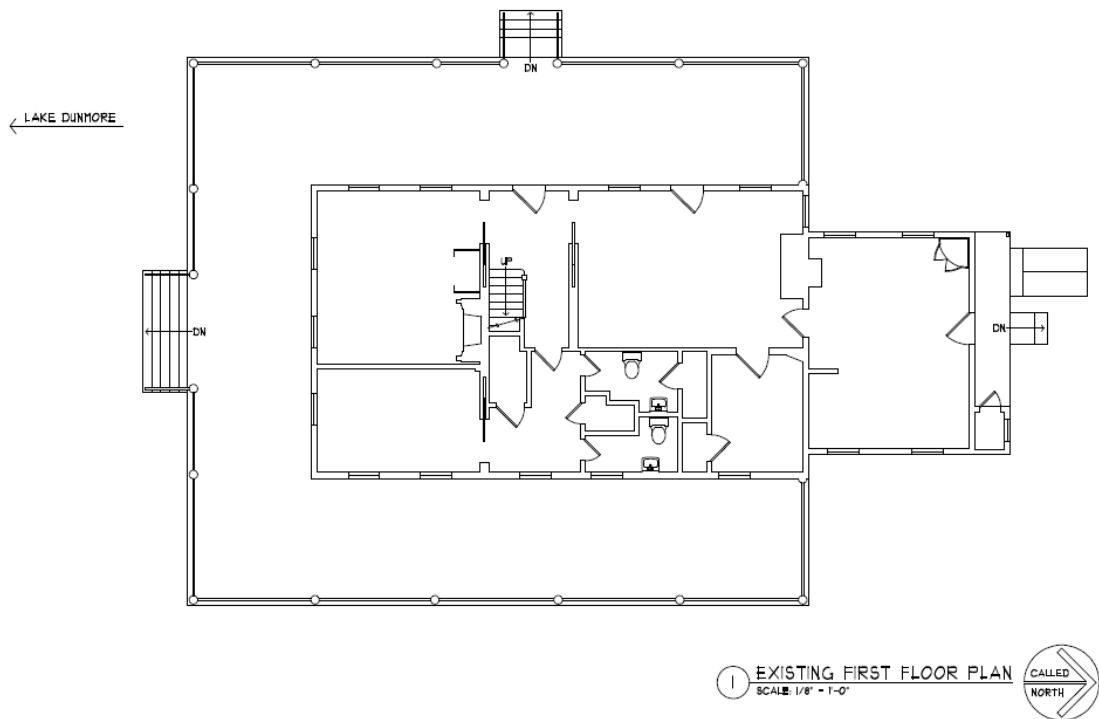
Keewaydin Manor House, existing first floor plan (NBF Architects 2016).
